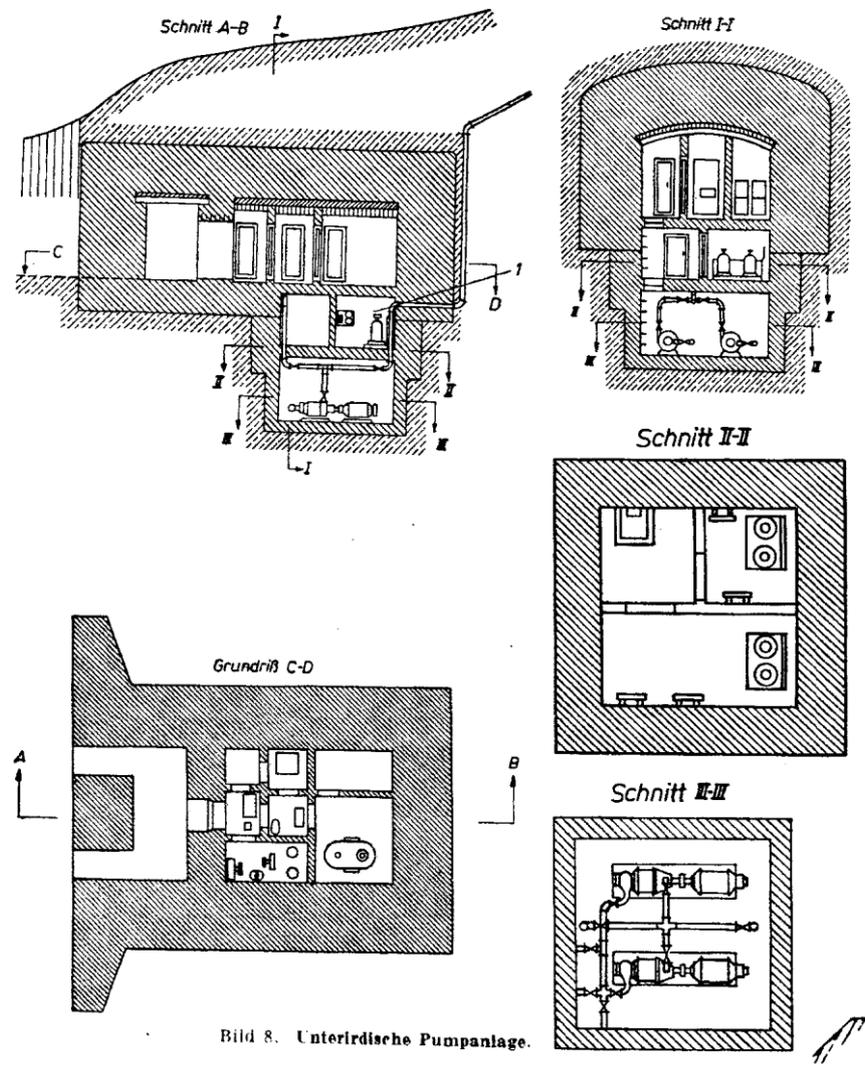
Diagram showing cross-sections of an underground pumping station, 1941, to illustrate reinforced concrete protection from aerial bombardment (Pohl, 1941: 304).
